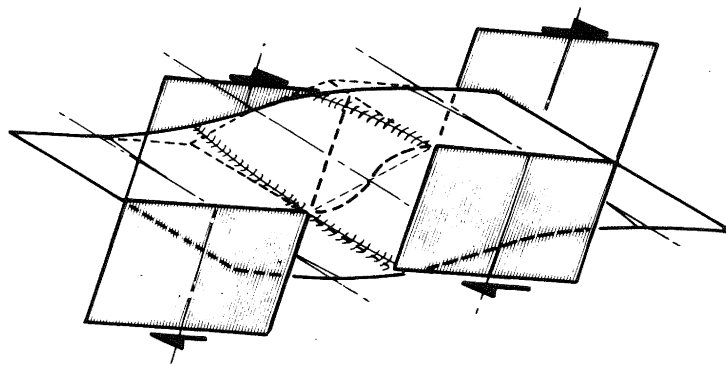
The Inelastic Deformations of a Slab Interconnecting two Laterally Loaded Shear Walls.
